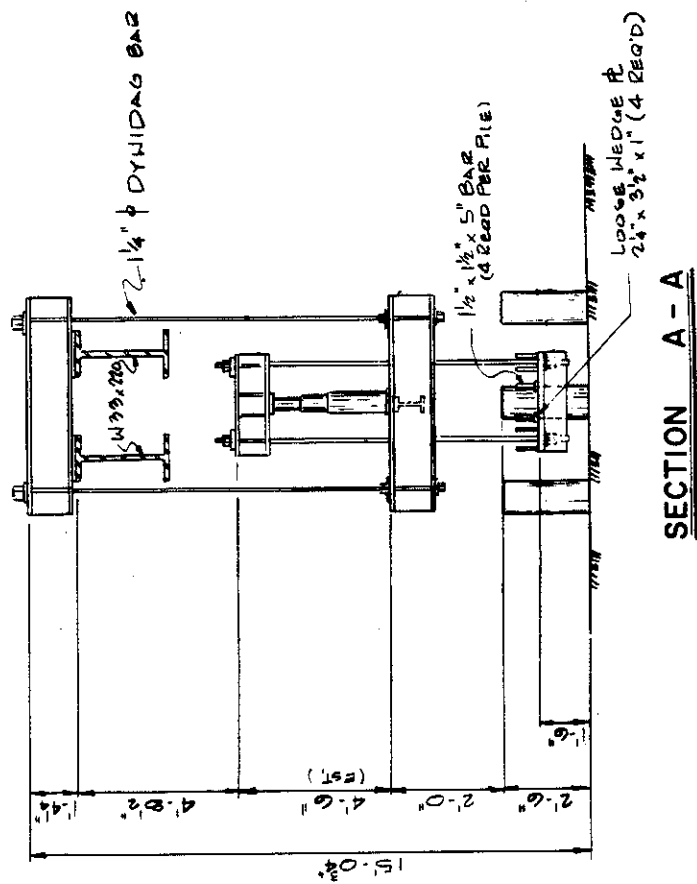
ELEVATION VIEW OF UPLIFT TEST ARRANGEMENT (SINGLE PILE)
